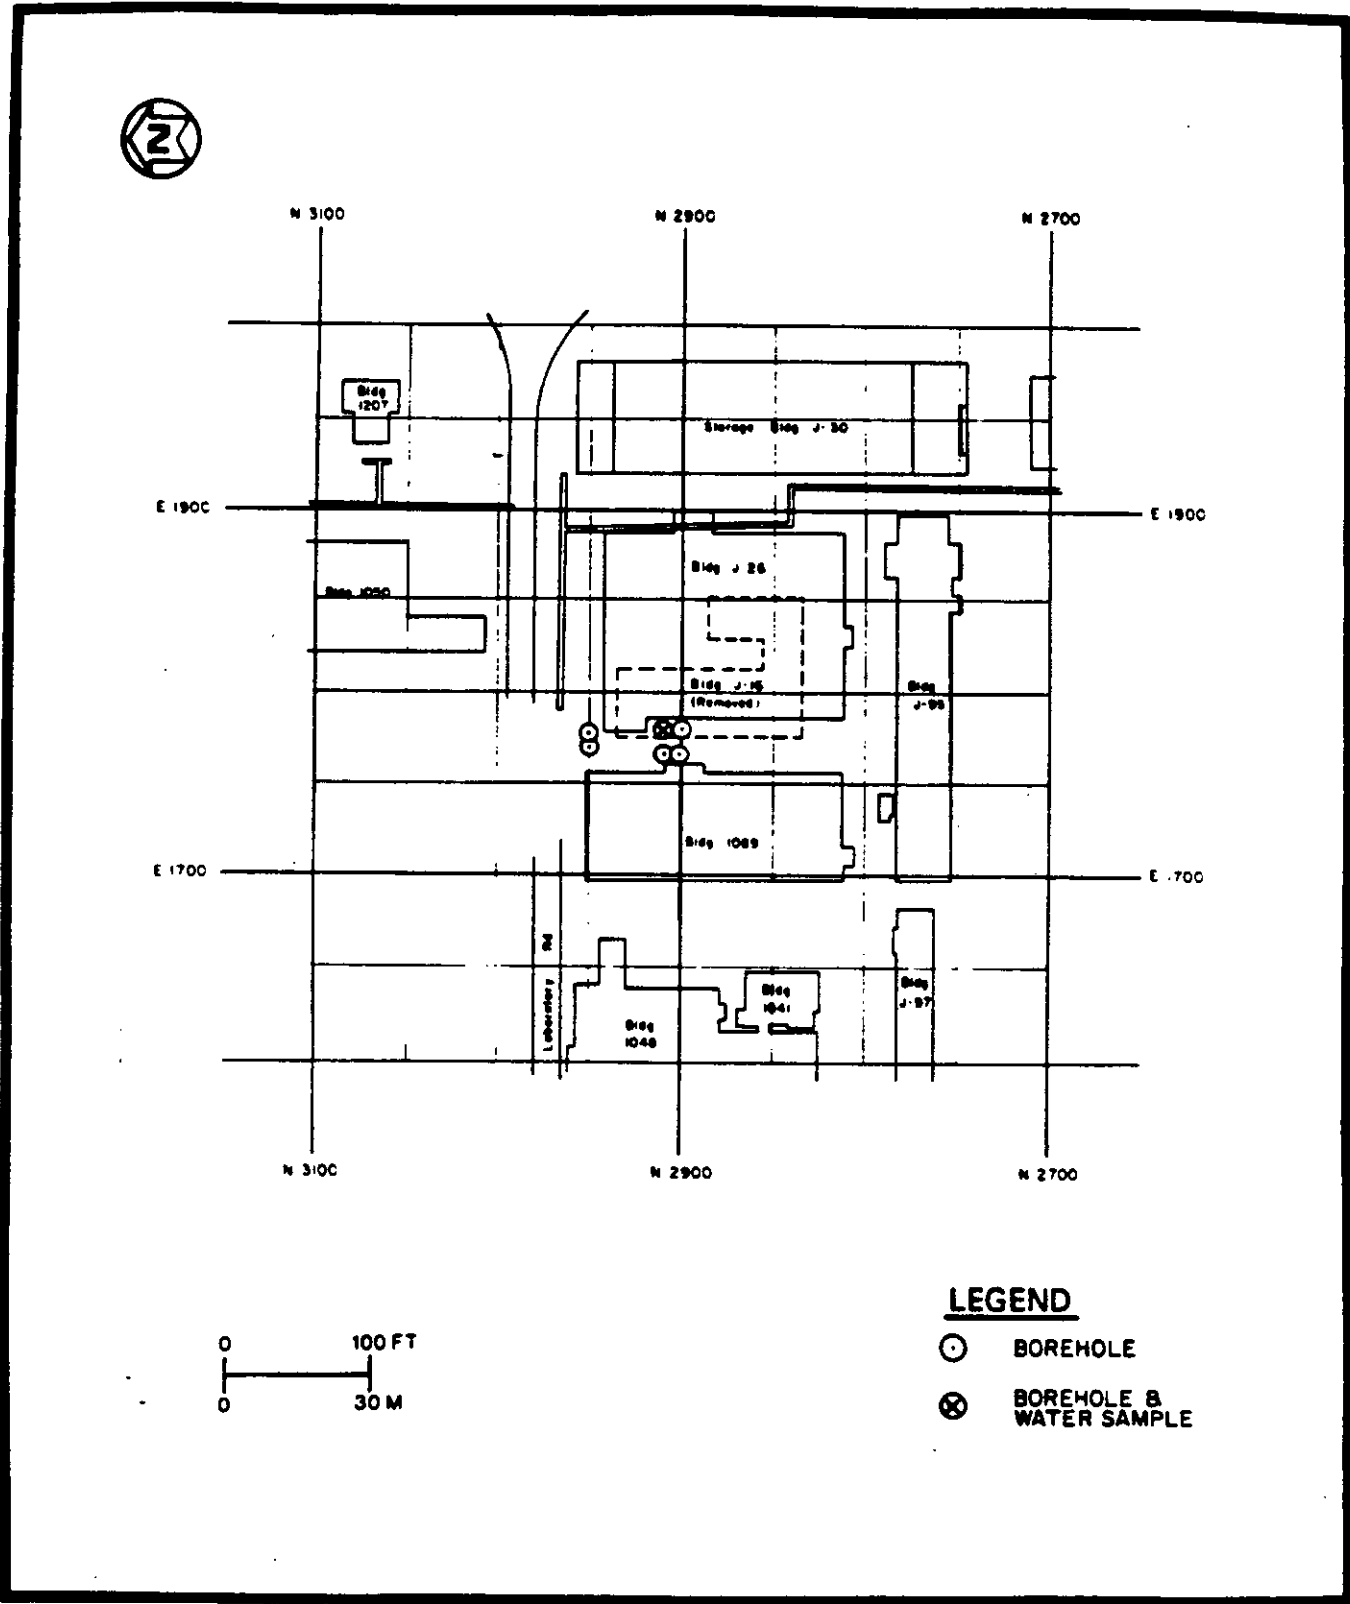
BOREHOLES AND WATER SAMPLING LOCATIONS, BUILDING J-26 AREA
